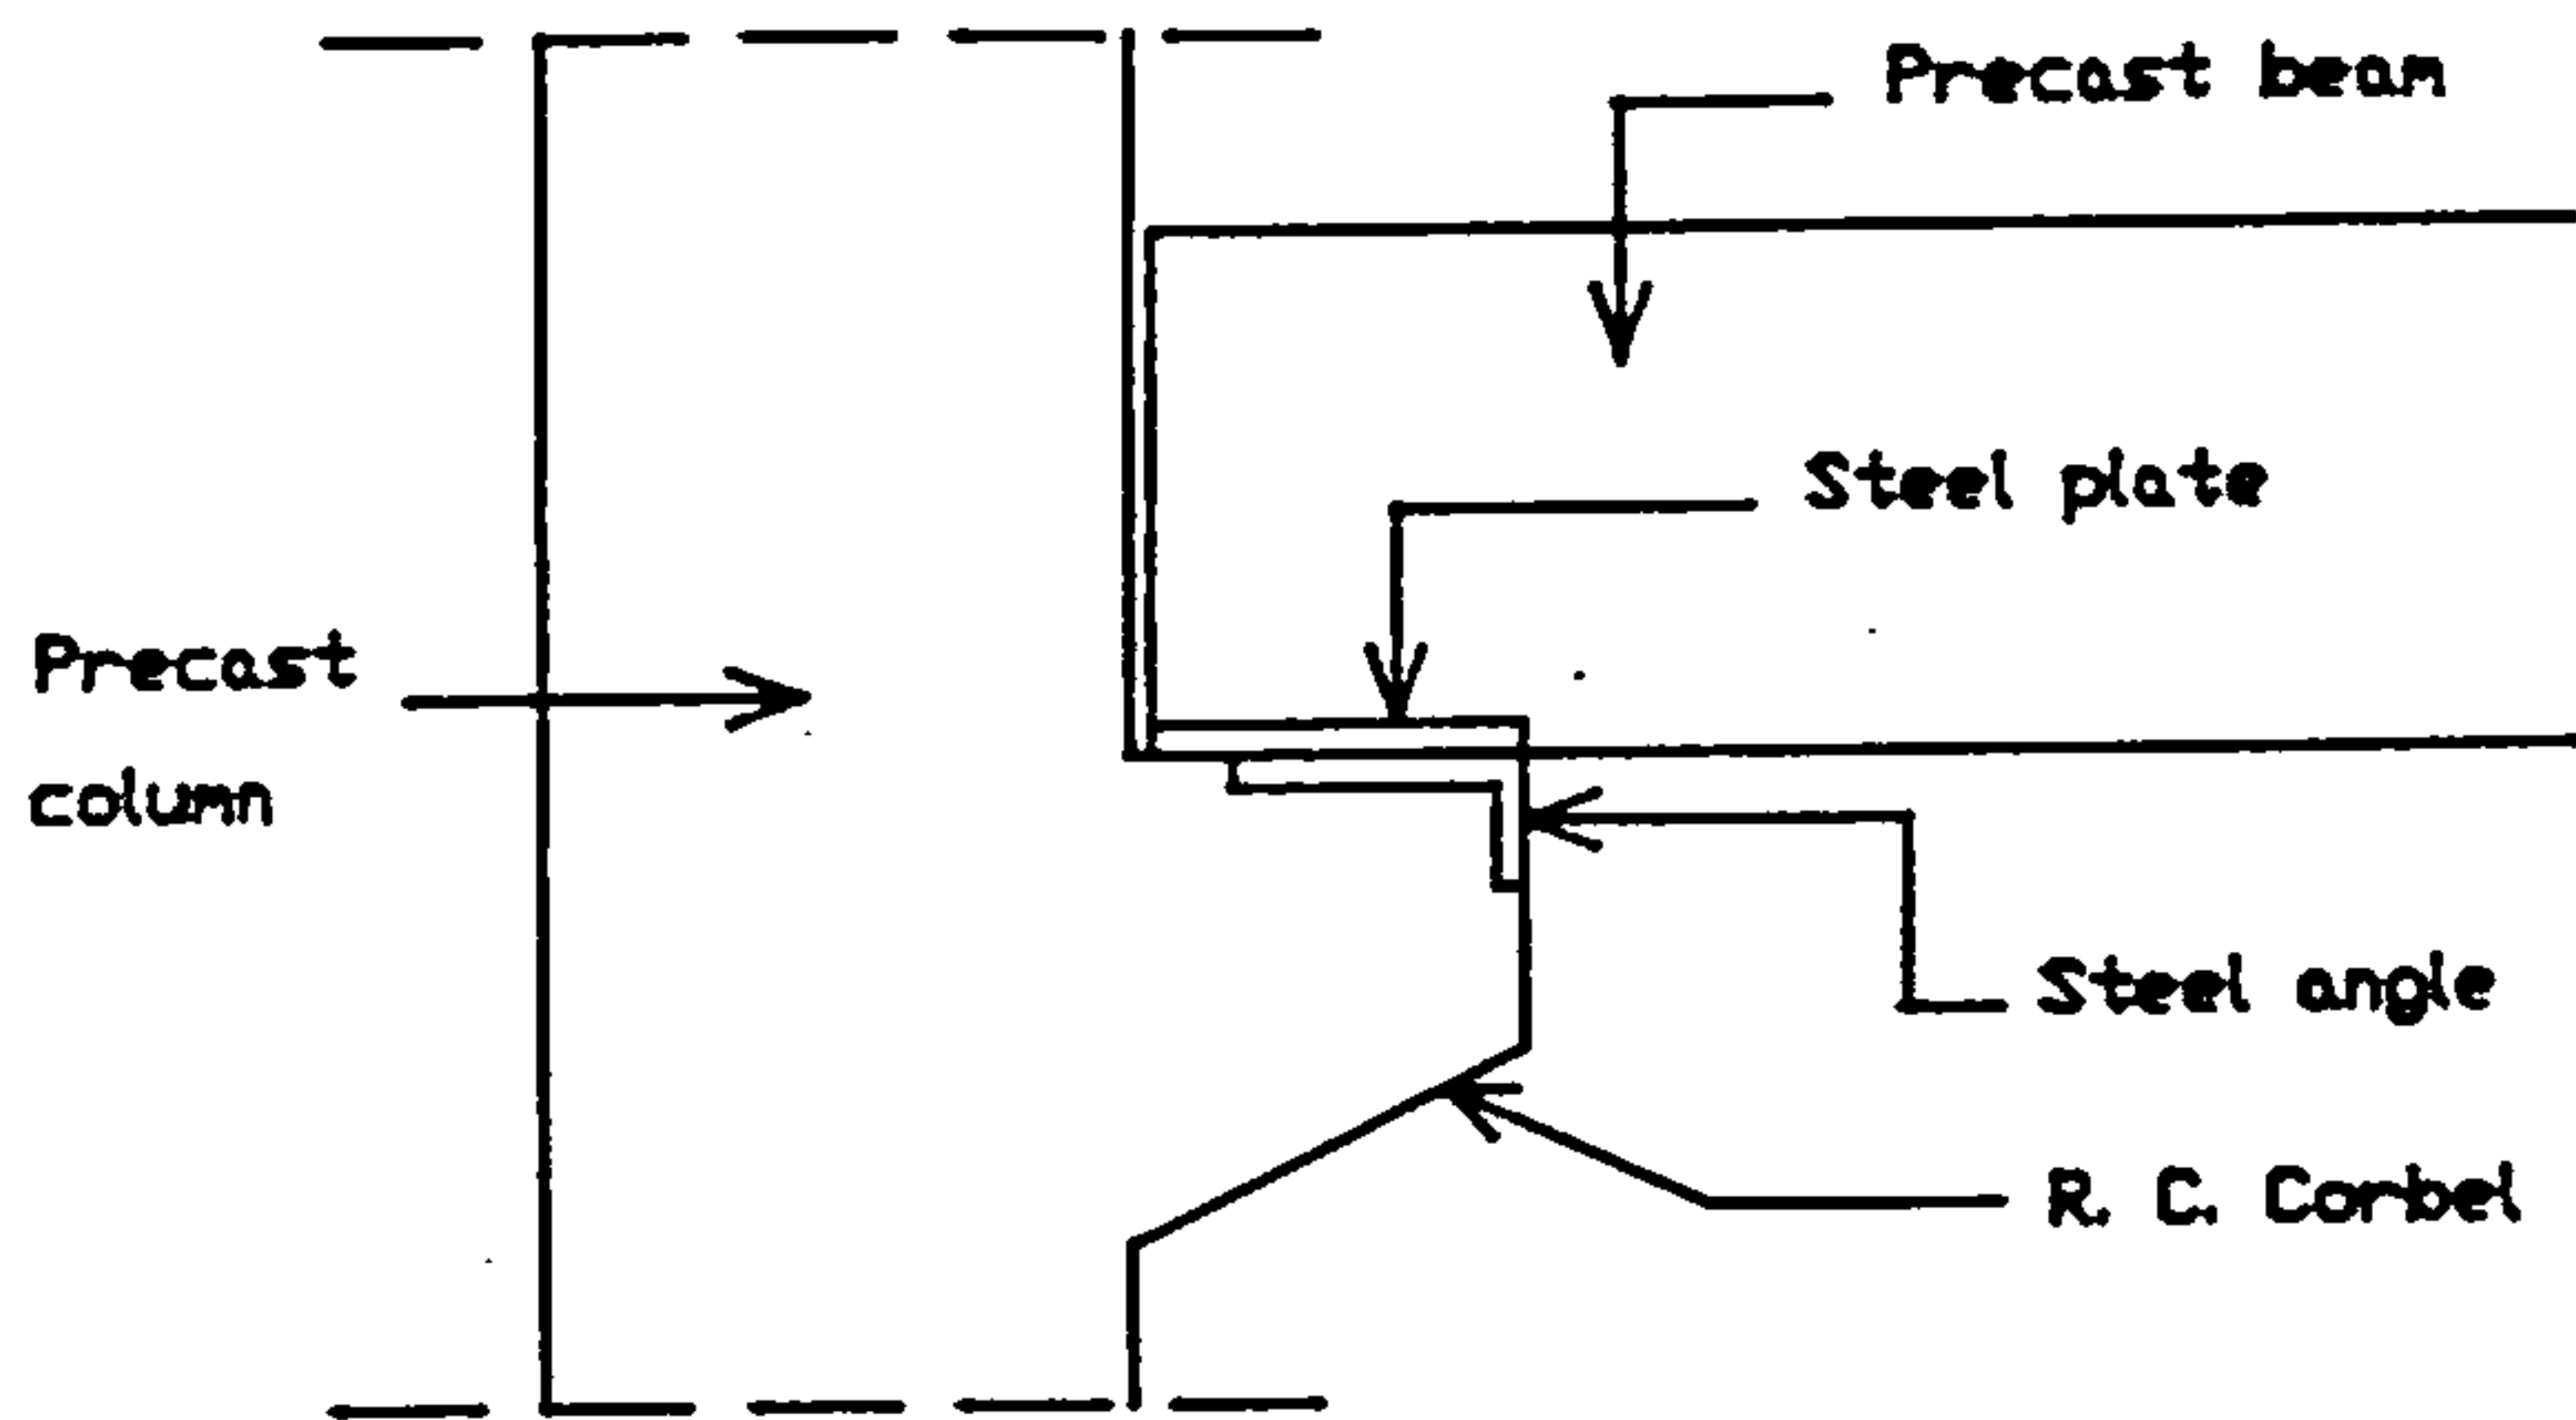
A BEAM-TO-COLUMN CONNECTION WITH A REINFORCED CONCRETE CORBEL.
